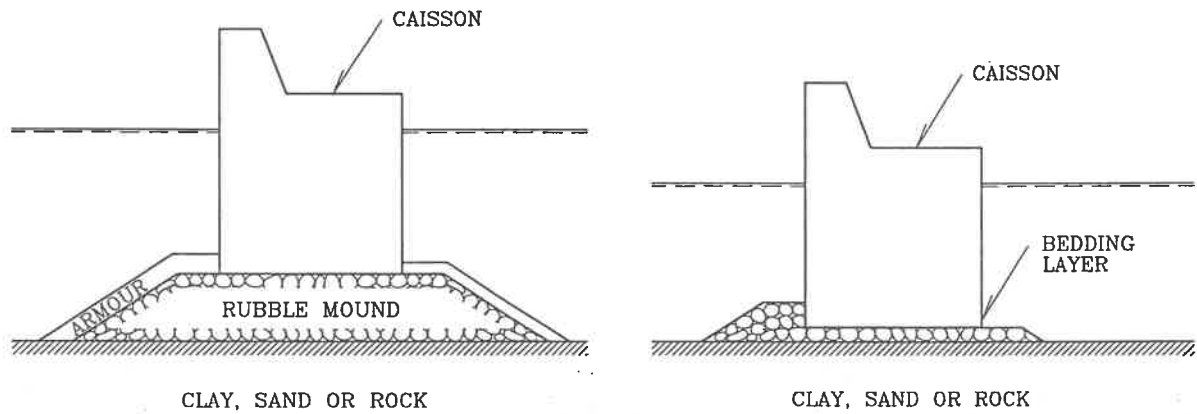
Monolithic vertical wall structure on high rubble foundation and on bedding layer.
